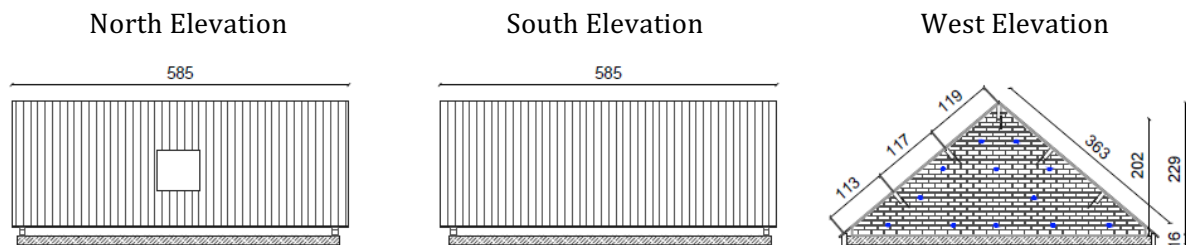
Elevation views of the LNEC-BUILD2 specimen (Correia et al., 2017)
